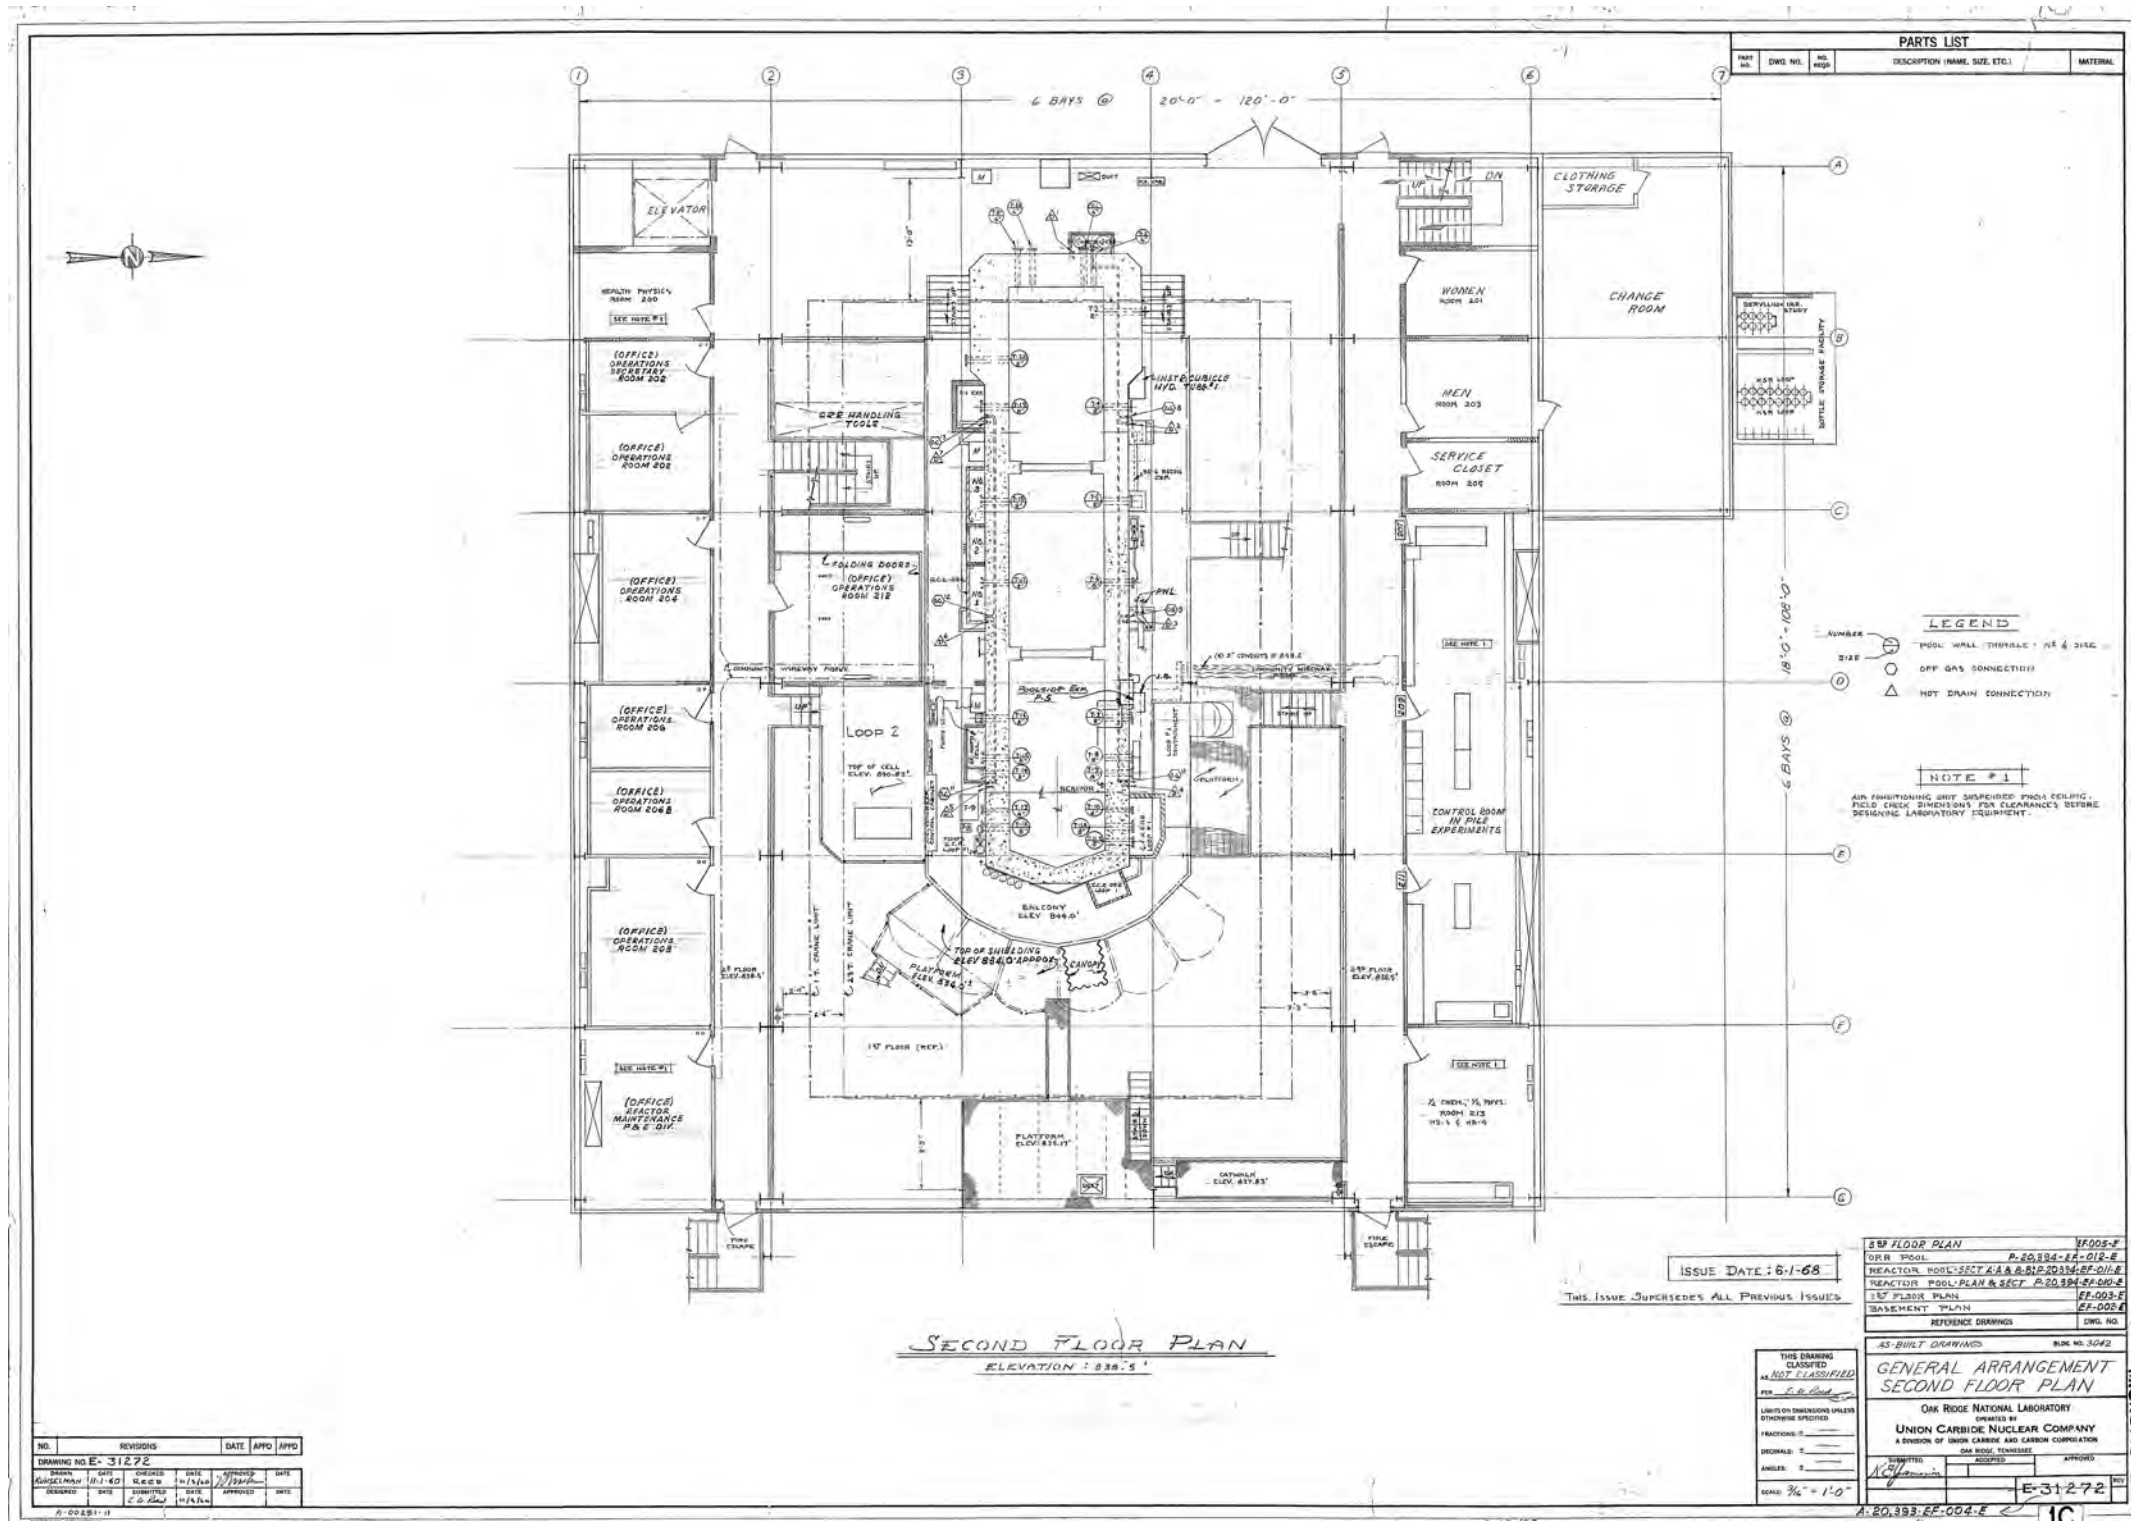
As built drawing showing the general arrangement of the second floor plan in Building 3042 (Oak Ridge National Laboratory, November 1, 1960 [drawn date], June 1, 1968 [issue date, with revisions]).
